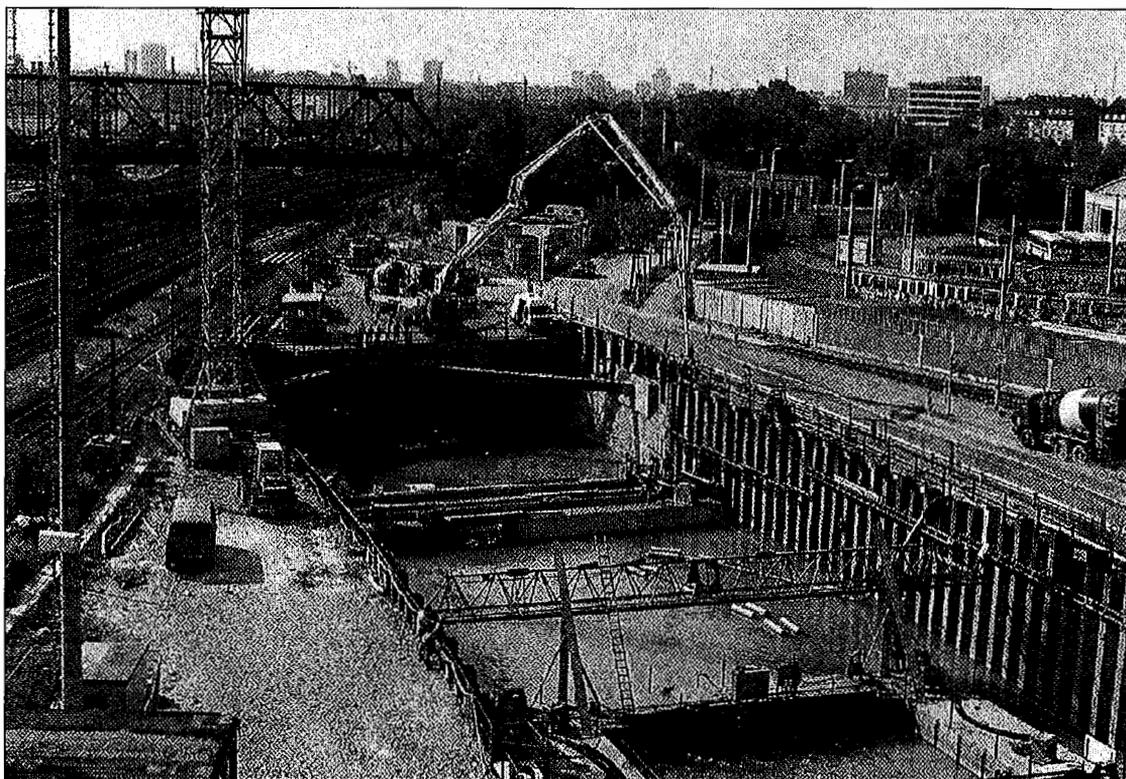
The southern side of the deep excavation for the Fahrlachtunnel.
